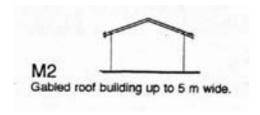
5: The M2 timber building as categorised in the Timber Buildings report. Source: Timber Buildings report, 1995, Attachment 2, p. 8
